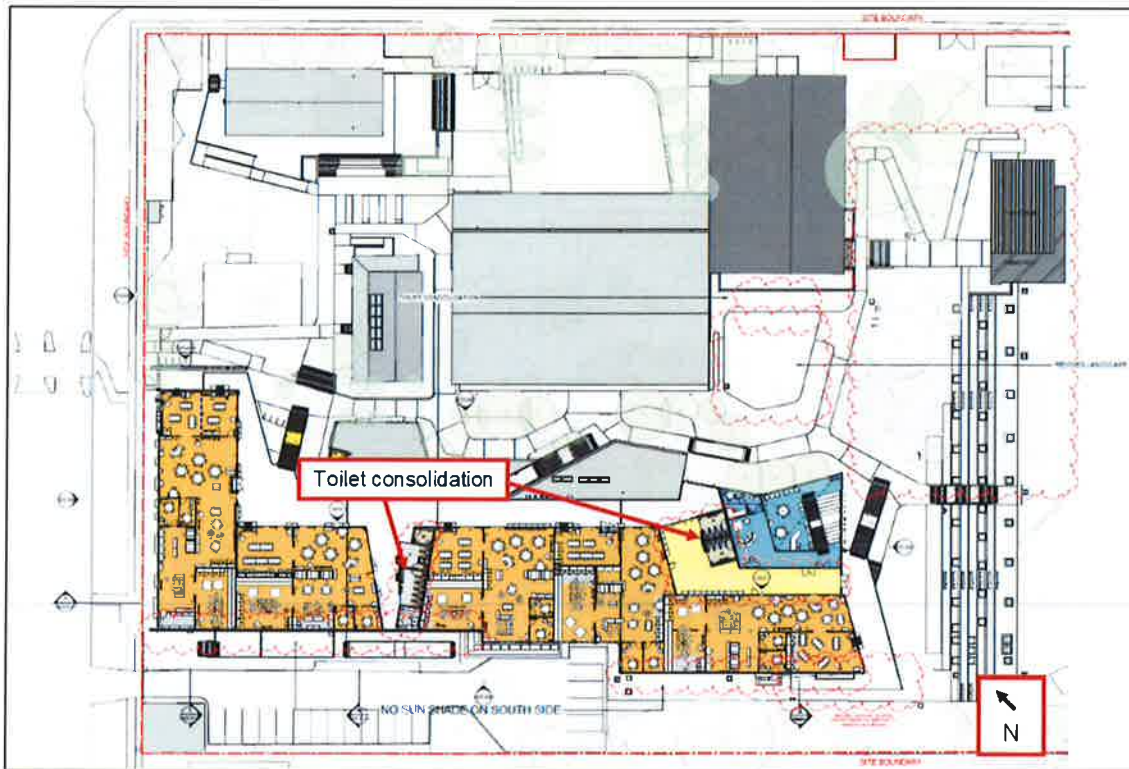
| Proposed First Floor Plan (Base source: Applicant's Modification Application 2019)
